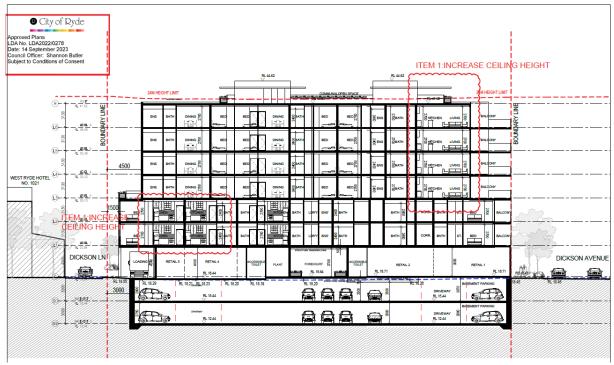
Approved Section Plan showing 24m maximum building height as red dashed line
